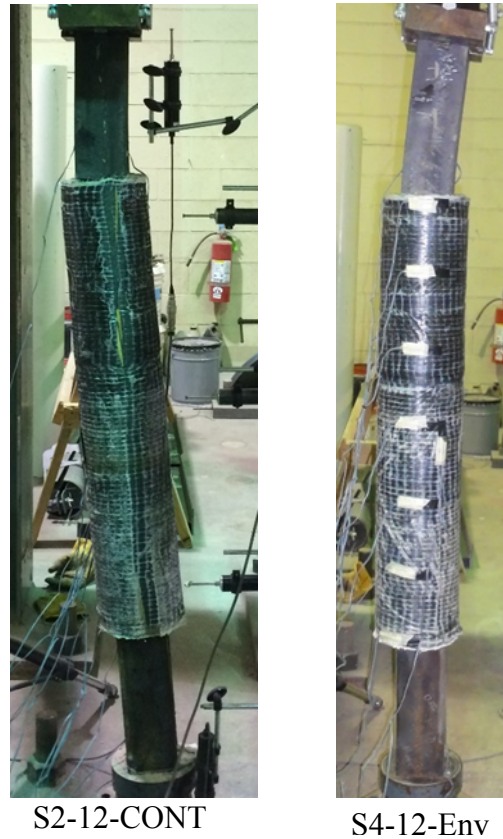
Failure of 4-in damaged piles repaired with Repair System 2 (S2-12-CONT and S2-12-Env)
